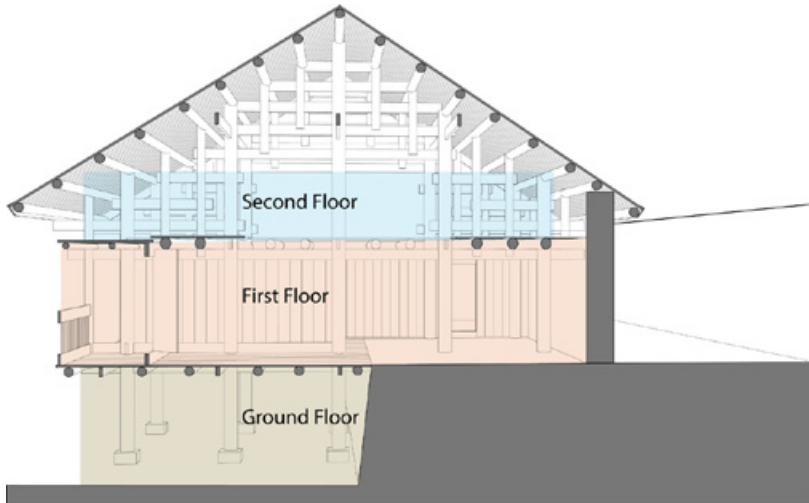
Vertical space pattern in a typical stilt dwelling in Banwan. (Source: Author)
